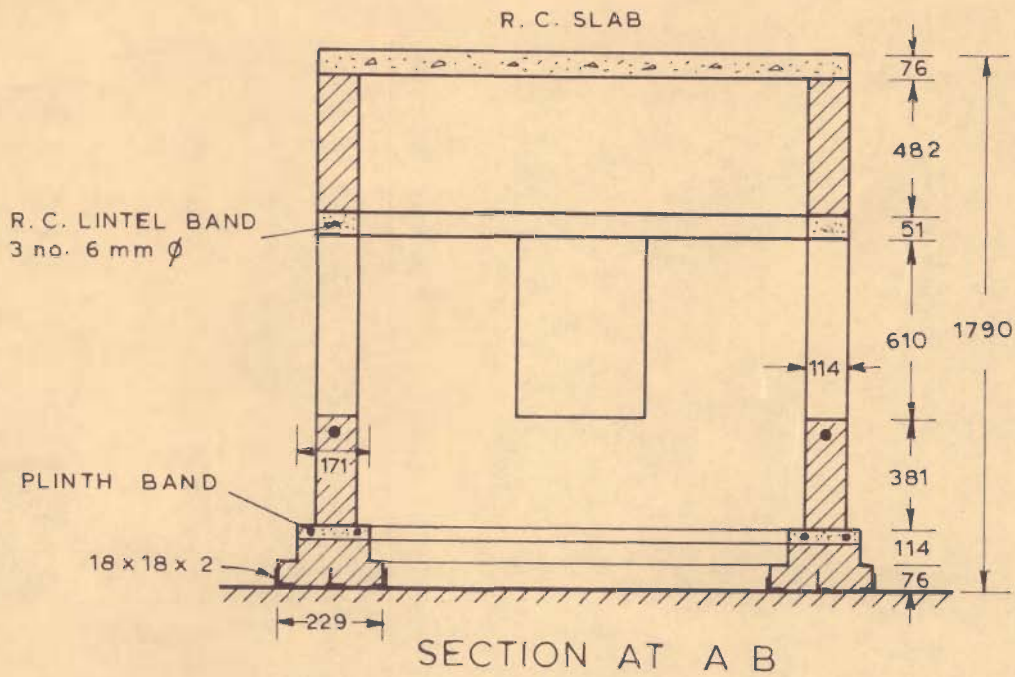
SLIDING TYPE BRICK BUILDING MODEL
